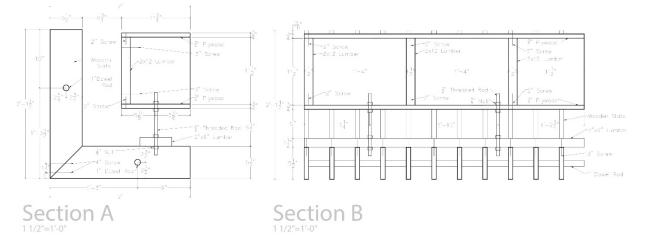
Section Drawings – Detail of Sirch Woodworking by Baumslager and Eberle – Drawings by ARC242 S17 Group 12 (C. Overmyer, R. Hoppe, and A. Bailey)
